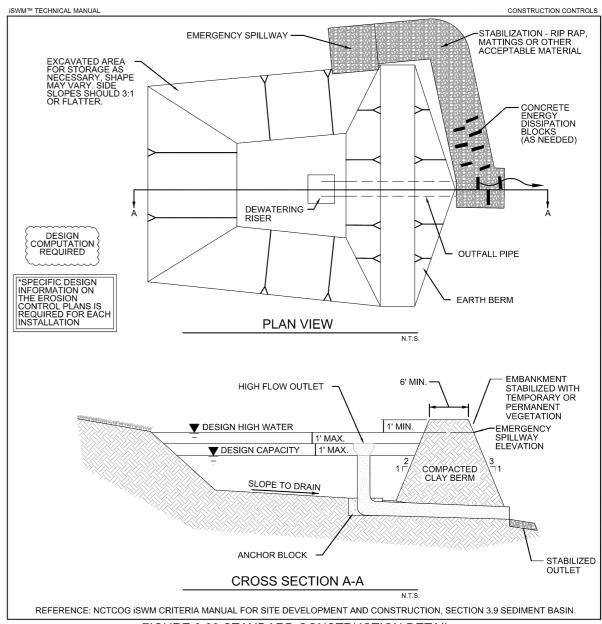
STANDARD CONSTRUCTION DETAIL -SEDIMENT BASIN WITH OVERFLOW RISER
